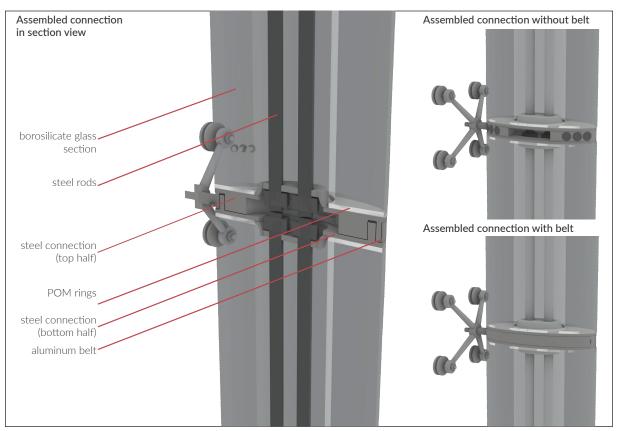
three views of the draft design illustrating all parts, this design has not been dimensioned yet
